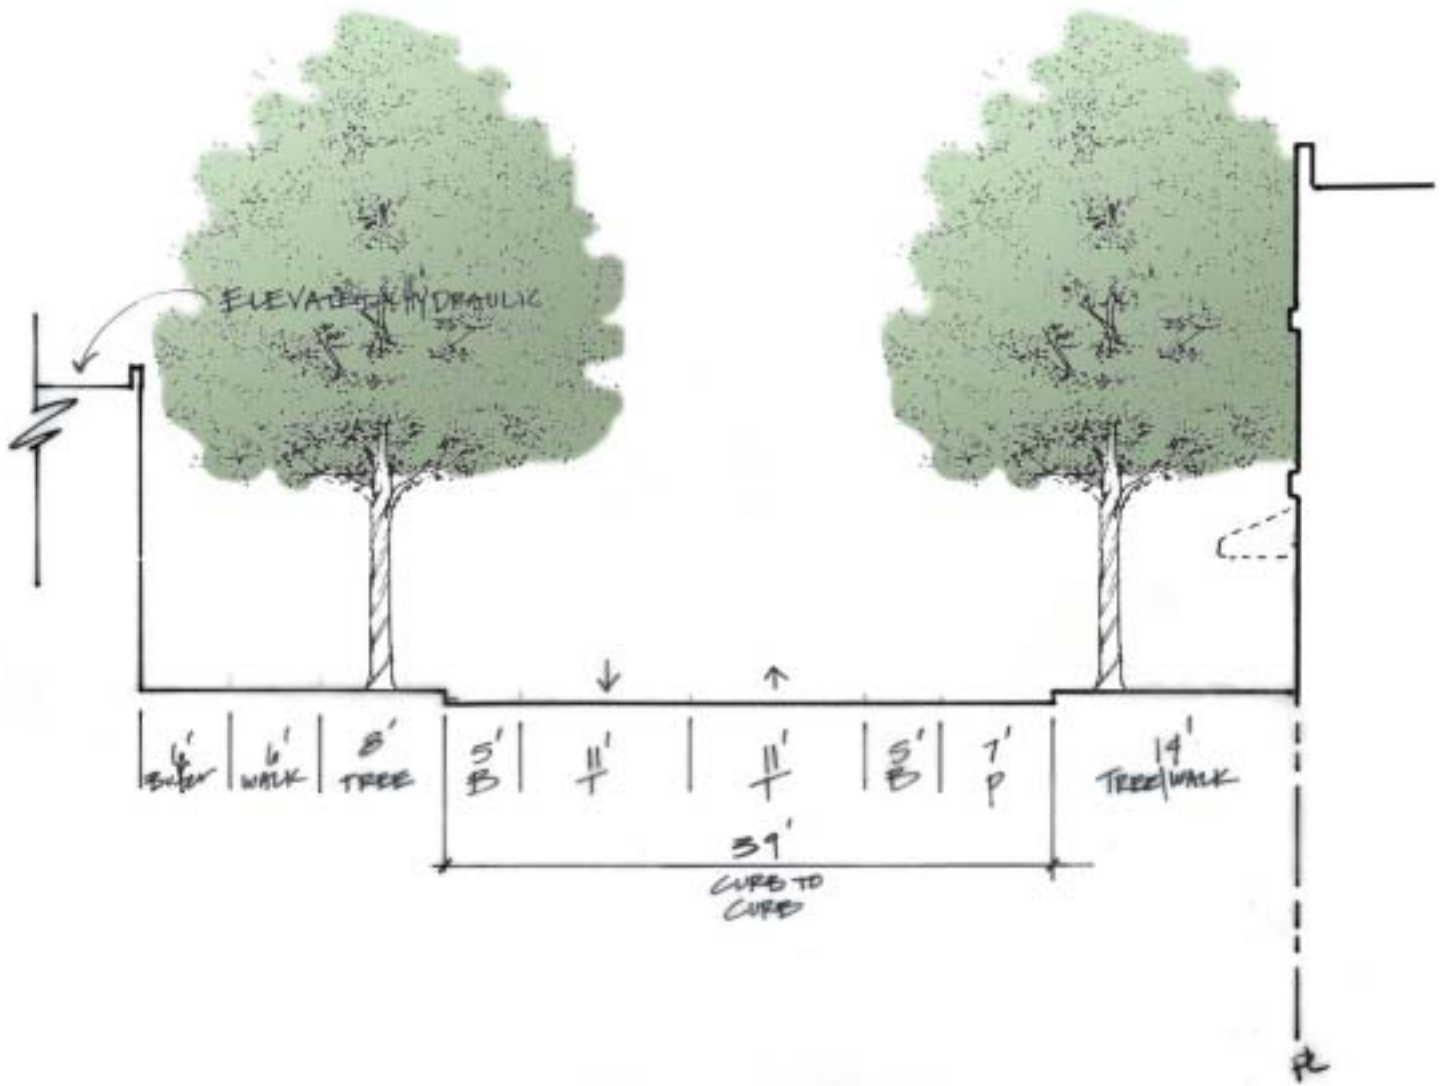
New Proposed Road Cross Section #6 - Holiday Drive
